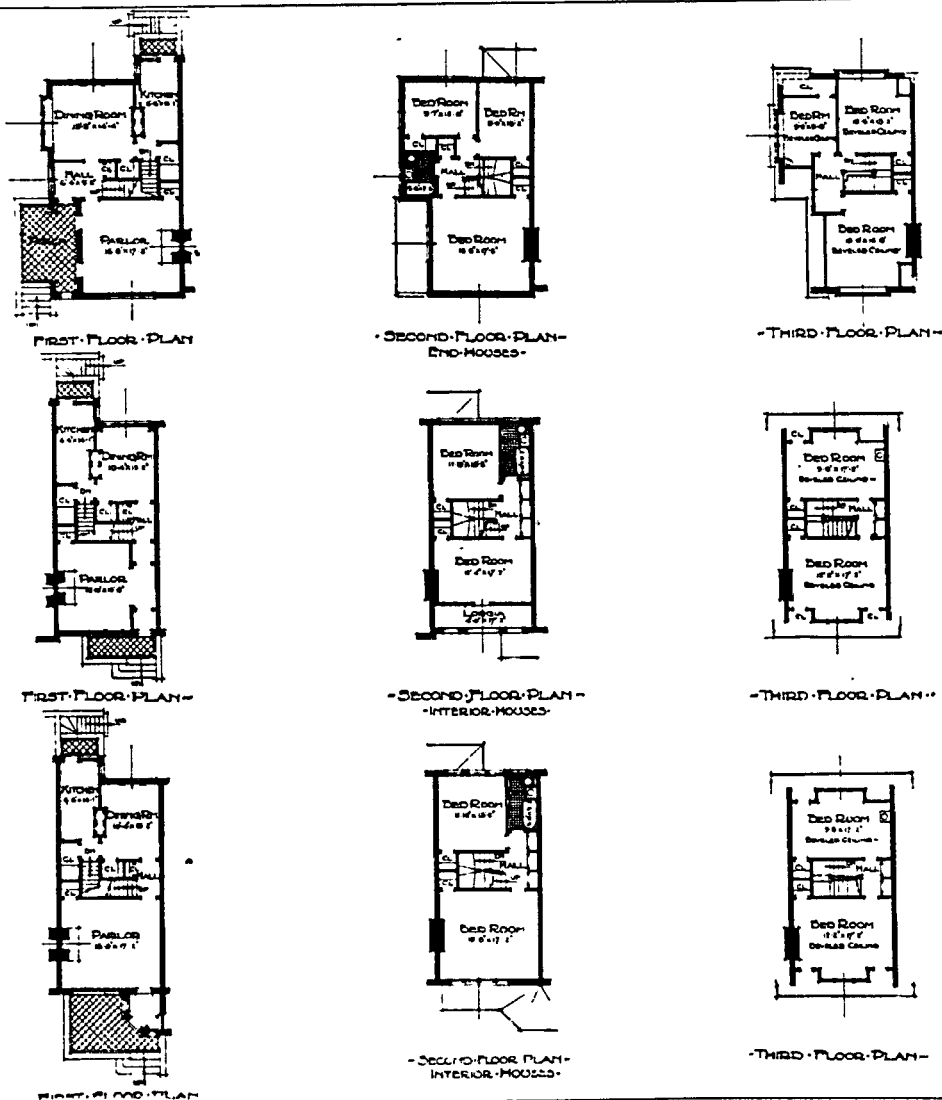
Group XIX. "Eight 18-Foot and 20-Foot Single Family Houses." Grosvenor Atterbury, Architect.
